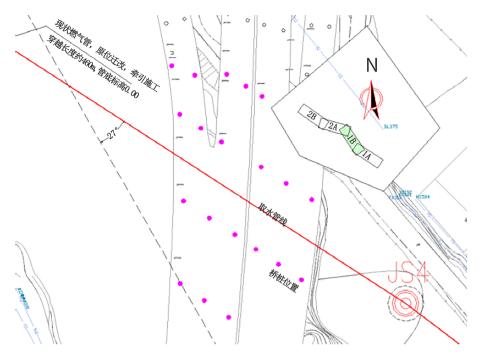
Layout chart of the water pipeline underneath pass the Yongguan expressway provincial road overpass bridge
